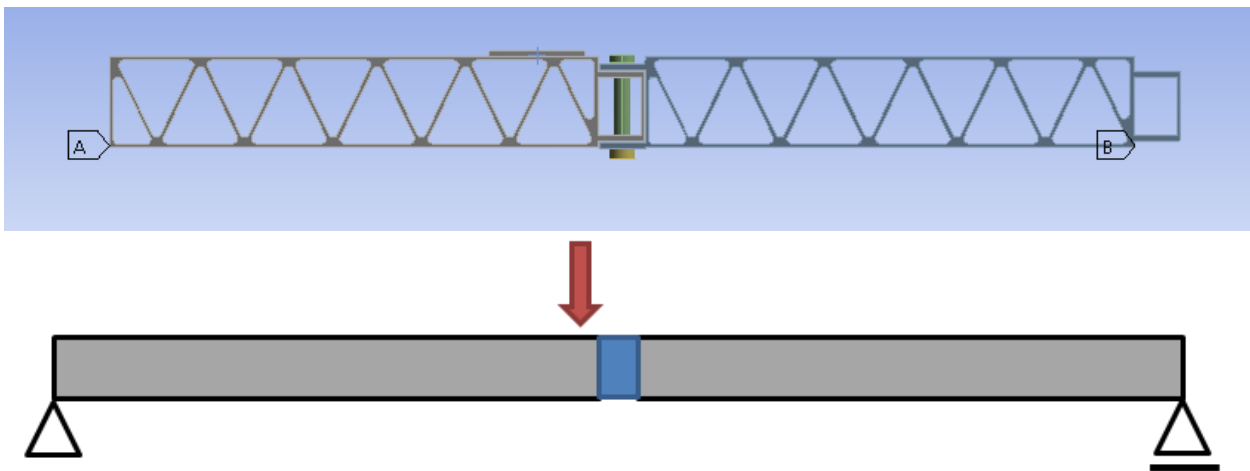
Cross-sectional view of the module/deck girders (above) and sketch of the schematic system used to represent it (below), in blue the connector joining the two girders at mid-span while the red arrow shows the position of the load
